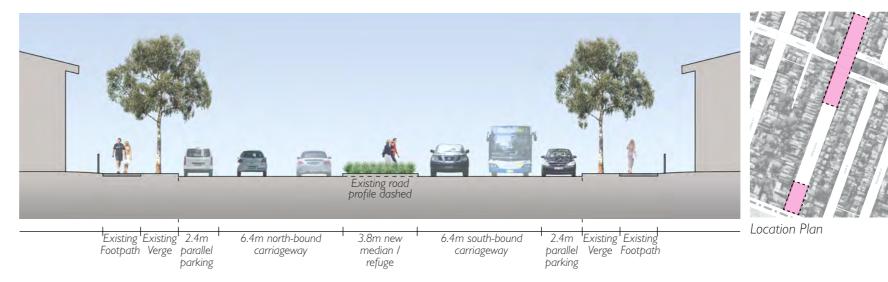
TYPICAL SECTION STREETSCAPE TYPE 1- PARALLEL PARKING BOTH SIDES, 1:200 @A3
